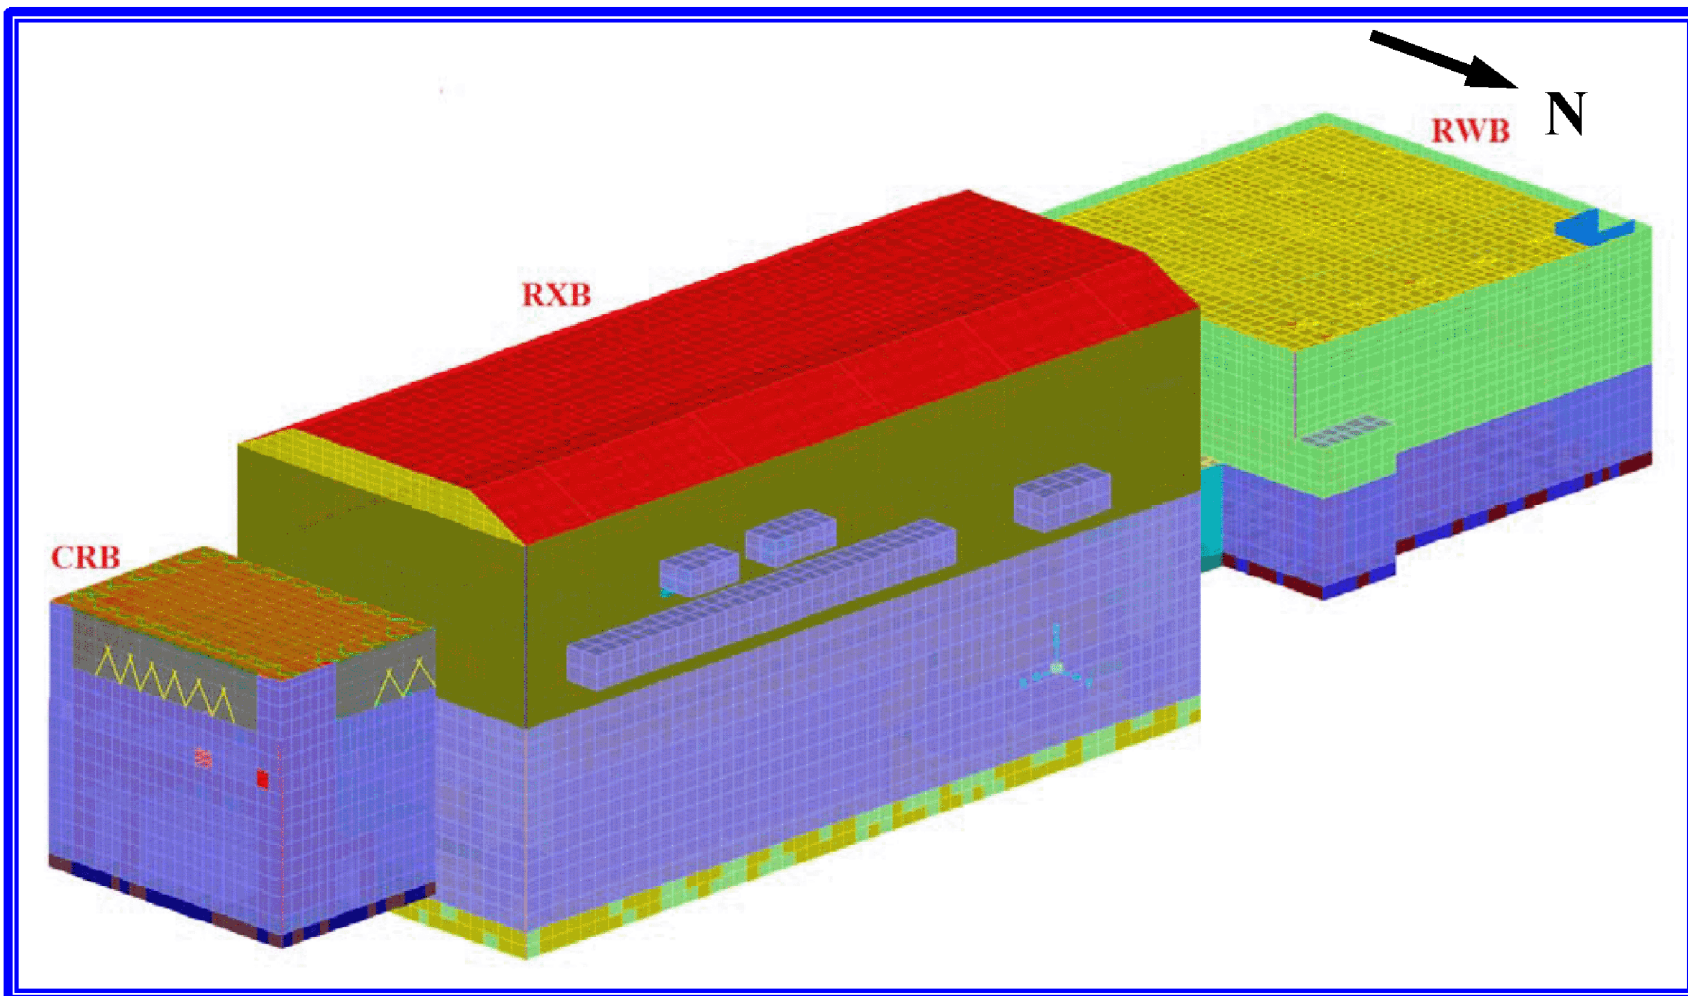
Isometric View of Backfill Soil Elements around the Three Buildings
